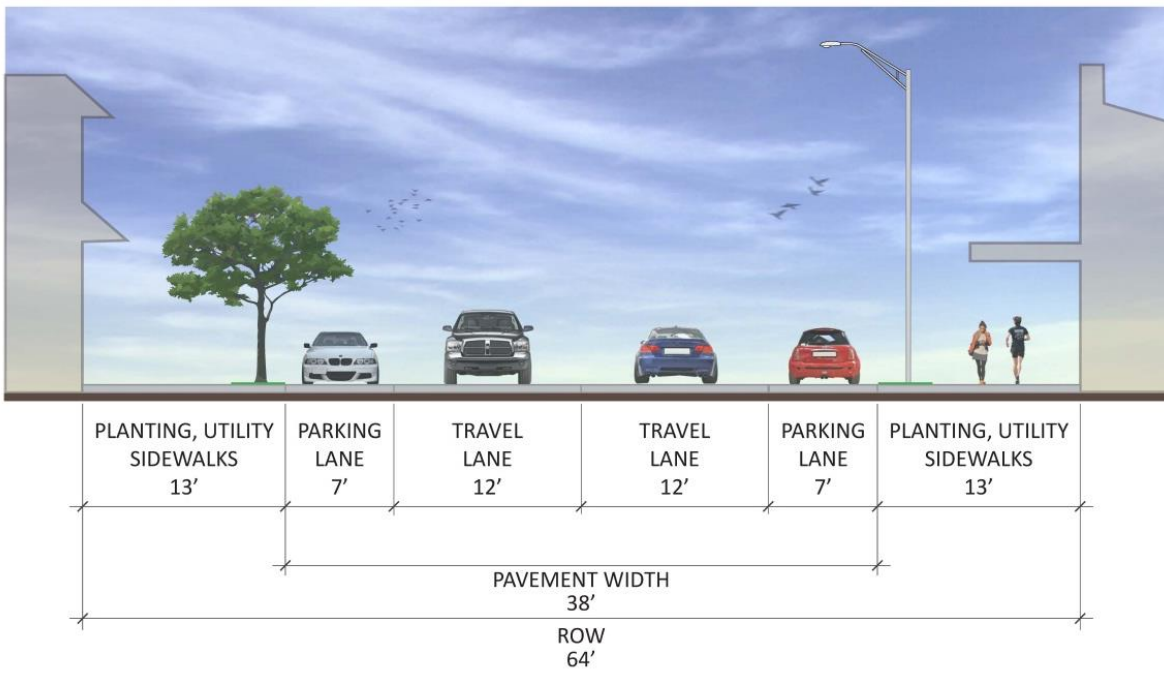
Recommended Urban Local Street Cross-Section - Option 2
